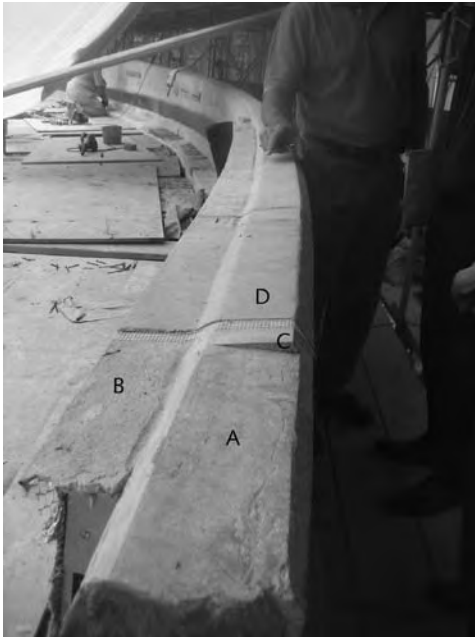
Onsite mock-up of new cementitious topping along the full-length of Rotunda parapet (© A. Ayón, WASA/Studio A, 2007). (Observers in the foreground are standing on the scaffold, facing the exterior of the Rotunda roof parapet. The worker in the foreground is facing the interior (roof side) of the parapet.
